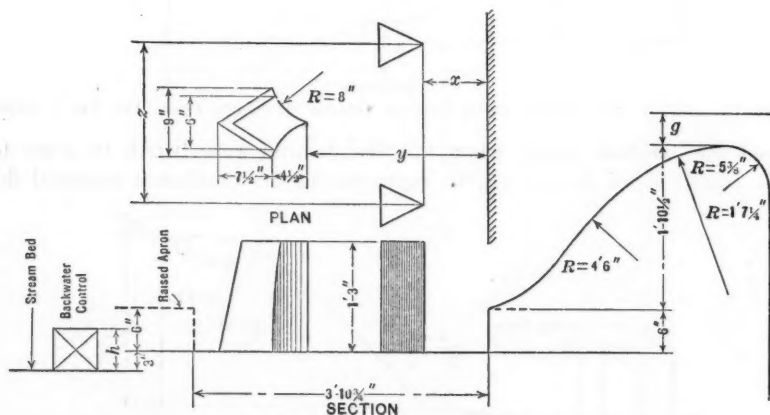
DETAILS OF MODEL WITH BAFFLE-PIERS, PIT NO. 4 DAM.
